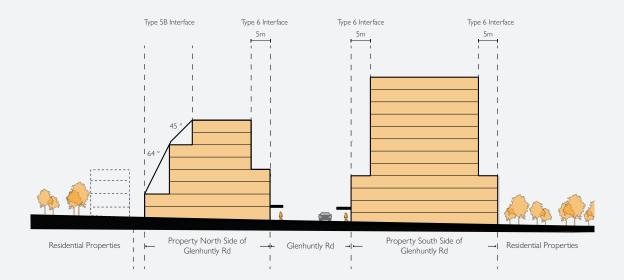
Cross section view of Glenhuntly Road looking east from Nepean Highway.
